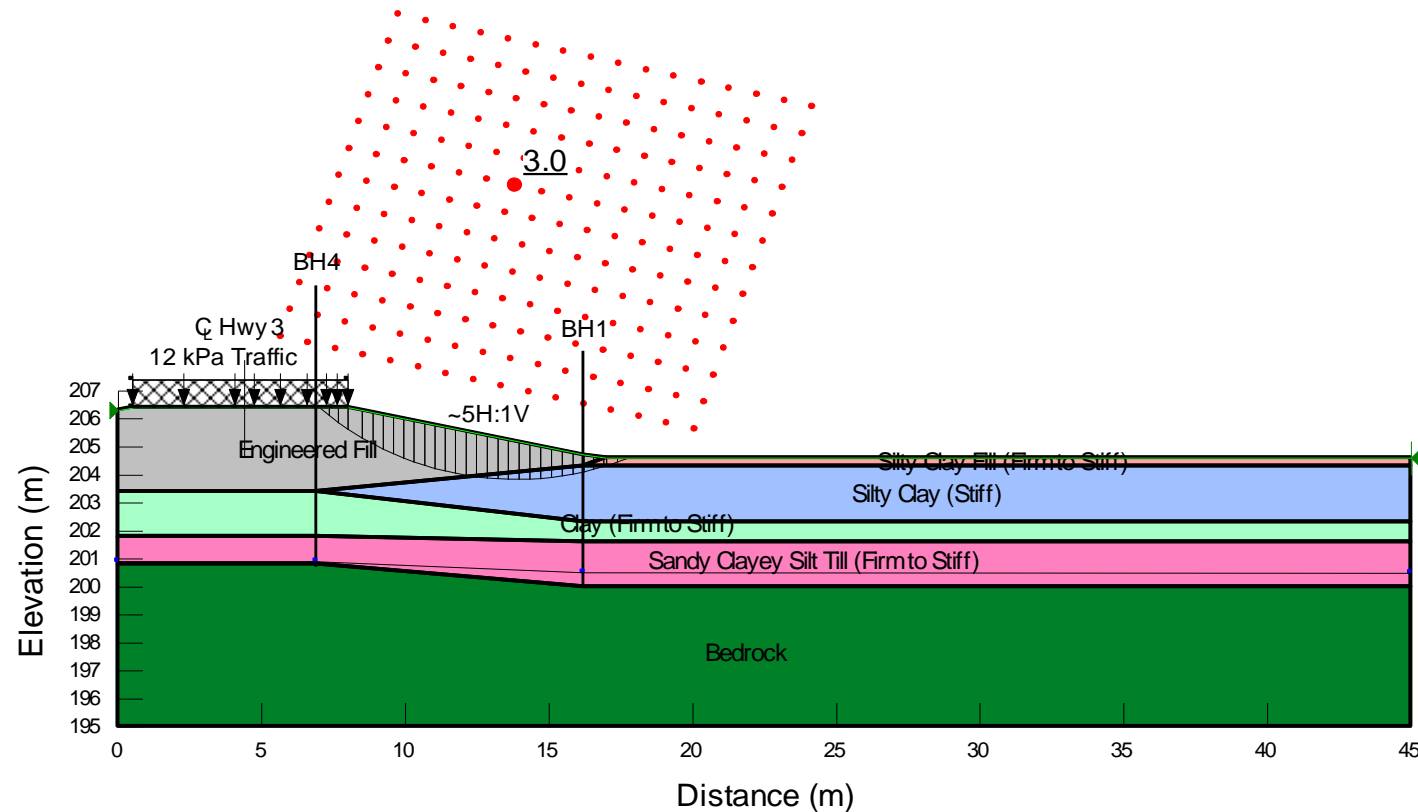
Slope stability analysis for embankment slope after culvert replacement – drained static conditions
